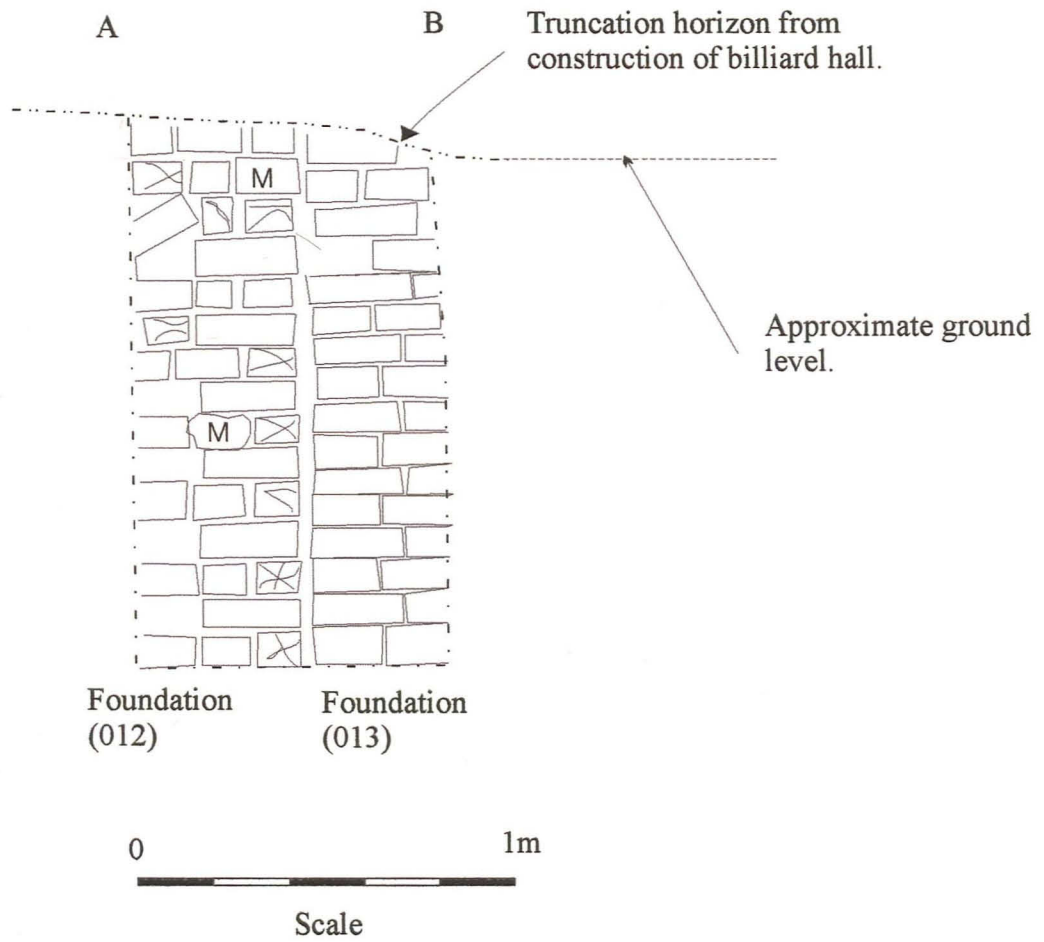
North facing section. Shows re-used foundation (012) on which building (001) was constructed. Location shown on Fig. 2.
